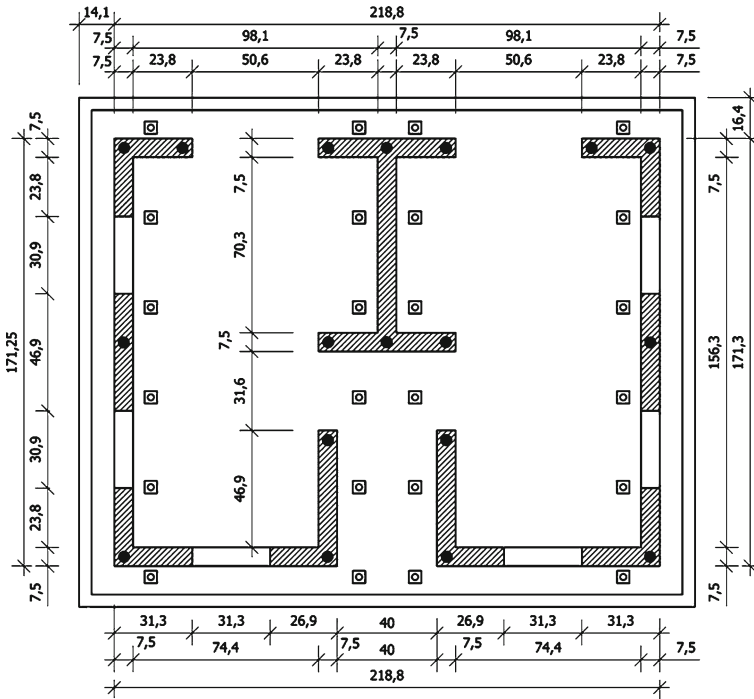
Distribution of walls and dimensions of models in plan (in cm). The dimensions of foundation slab and position of holes to bolt the slab on the shaking table are also indicated
